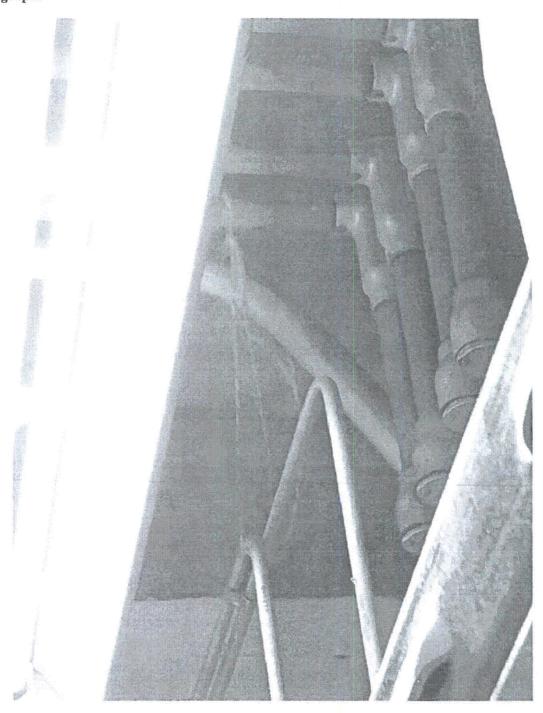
Instrument Tubing Tied to Conduit (C140)
